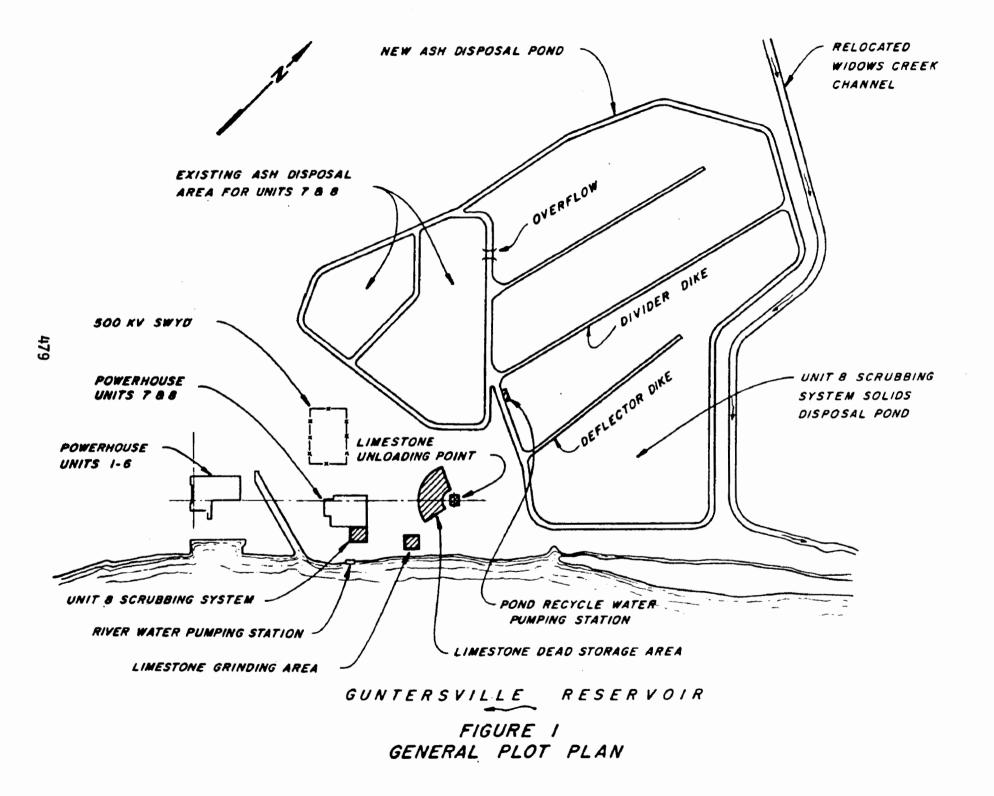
is a general plot plan of the Widows Creek Steam Plant showing the general location of the scrubber facility, limestone storage, handling and grinding facilities, and the solids disposal area with respect to existing facilities.
